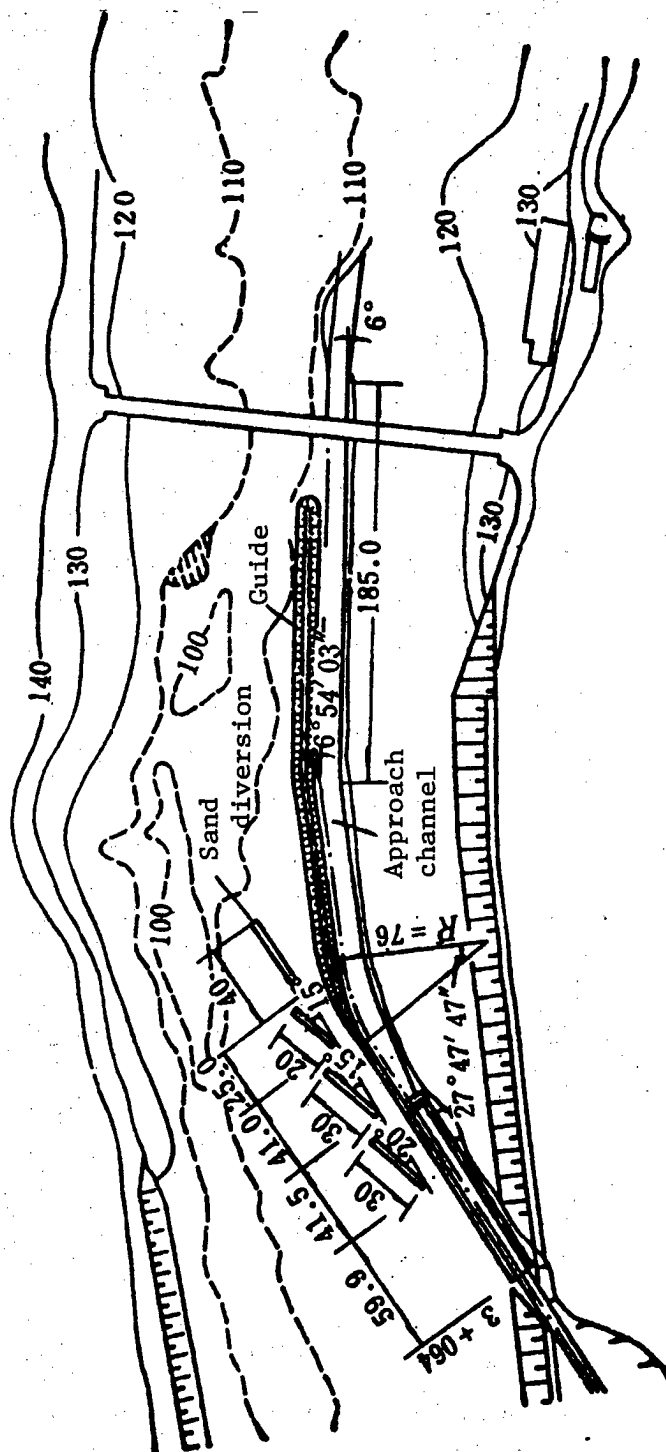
Plane Layout of Downstream Approach Channel of the Fengtan Hydropower Station
